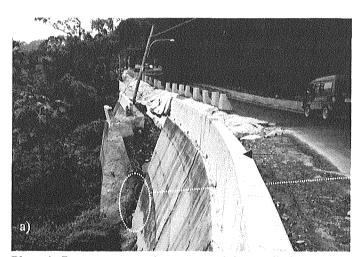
Damage to gravity type retaining wall due to failure of subsoil layers (along District Road No. 129; site 3 in Fig.1)
